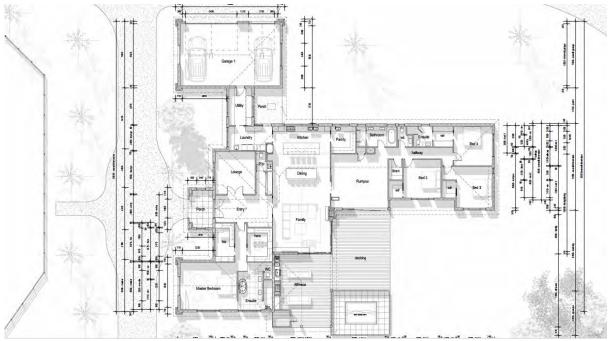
Floor Plan (source: BB Design and Documentation, Proposed Floor Plan).
